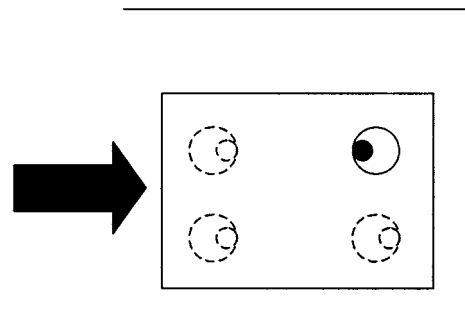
b. Baseplate loaded in shear and possible first anchor rod bearing on its baseplate shear hole.
